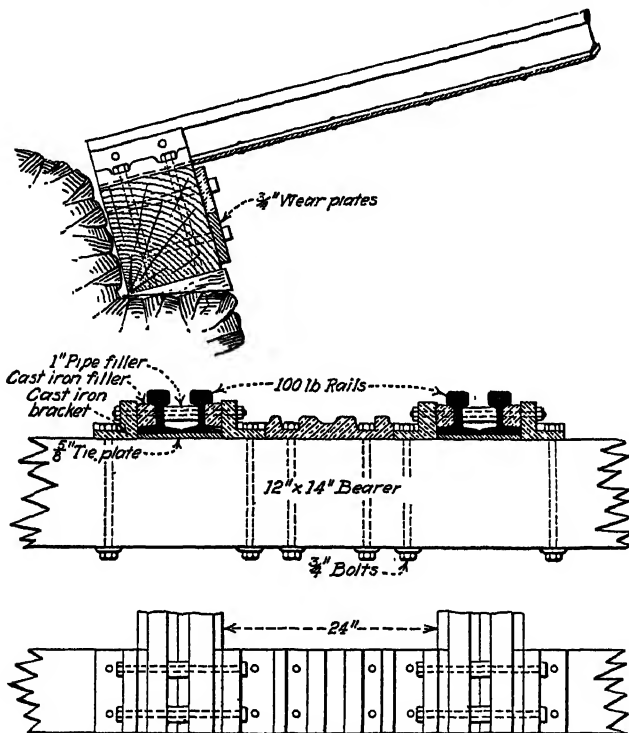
DETAIL OF GRIZZLY SHOWN IN FIG. 3.
